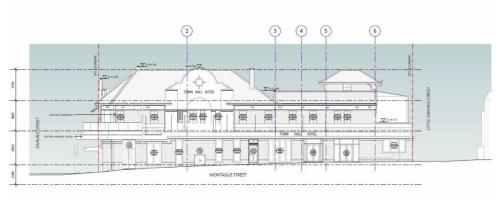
Elevation – West from Montague Street – Proposed. Source: Public Design Studio, AR-DA-0205, Rev 02, 29.7.2022
